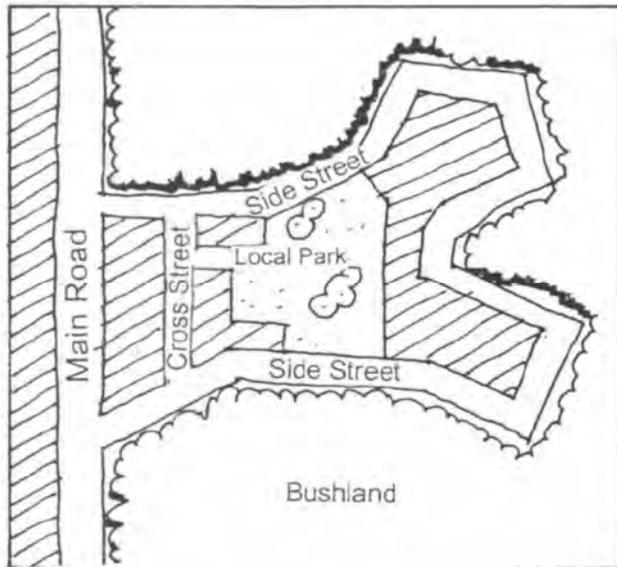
Preferred road layout in and adjoining bushfire hazard areas
